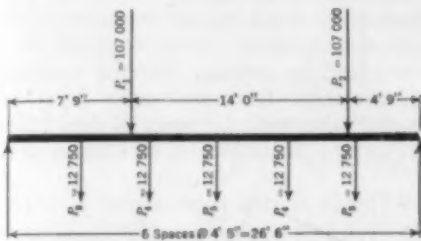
LOADING DIAGRAM FOR THE PLATE GIRDER IN EXAMPLE 1
